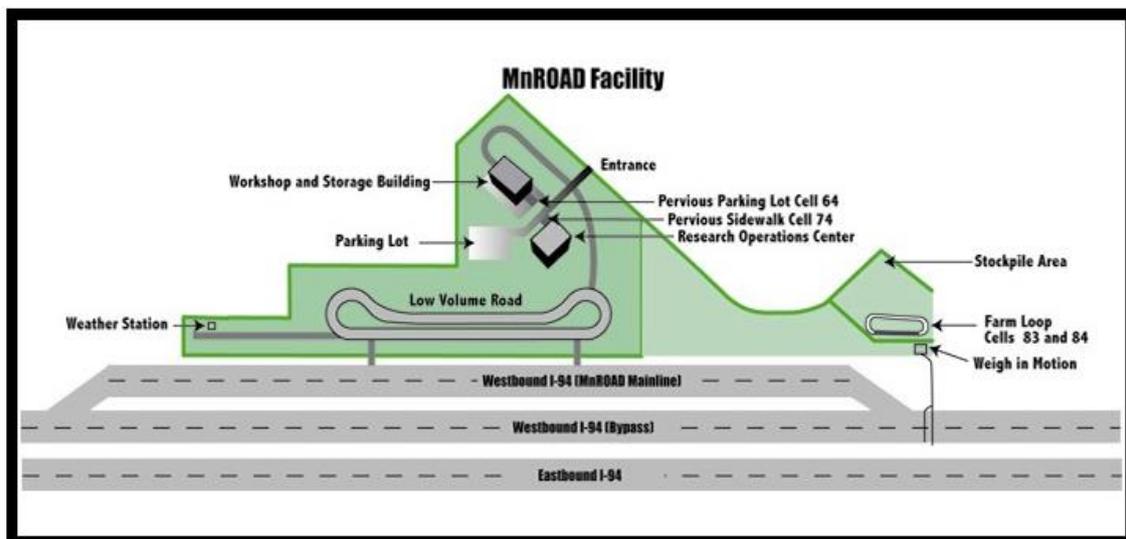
MnROAD Testing Facility Showing Low Volume Road (Loop)
